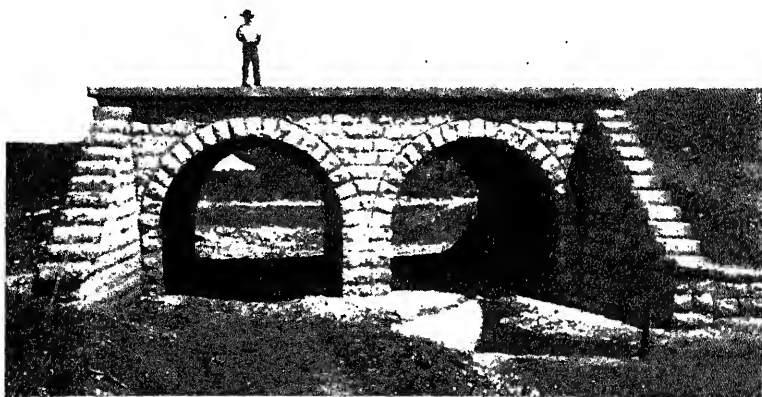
Double Arch Culvert. Openings, 14 by 5½ Feet
